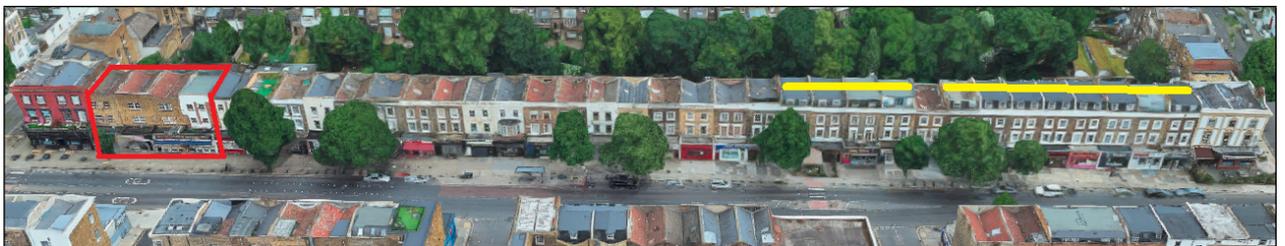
Aerial of terrace group from the west. Existing roof extensions shown in yellow, application site outlined in red.
